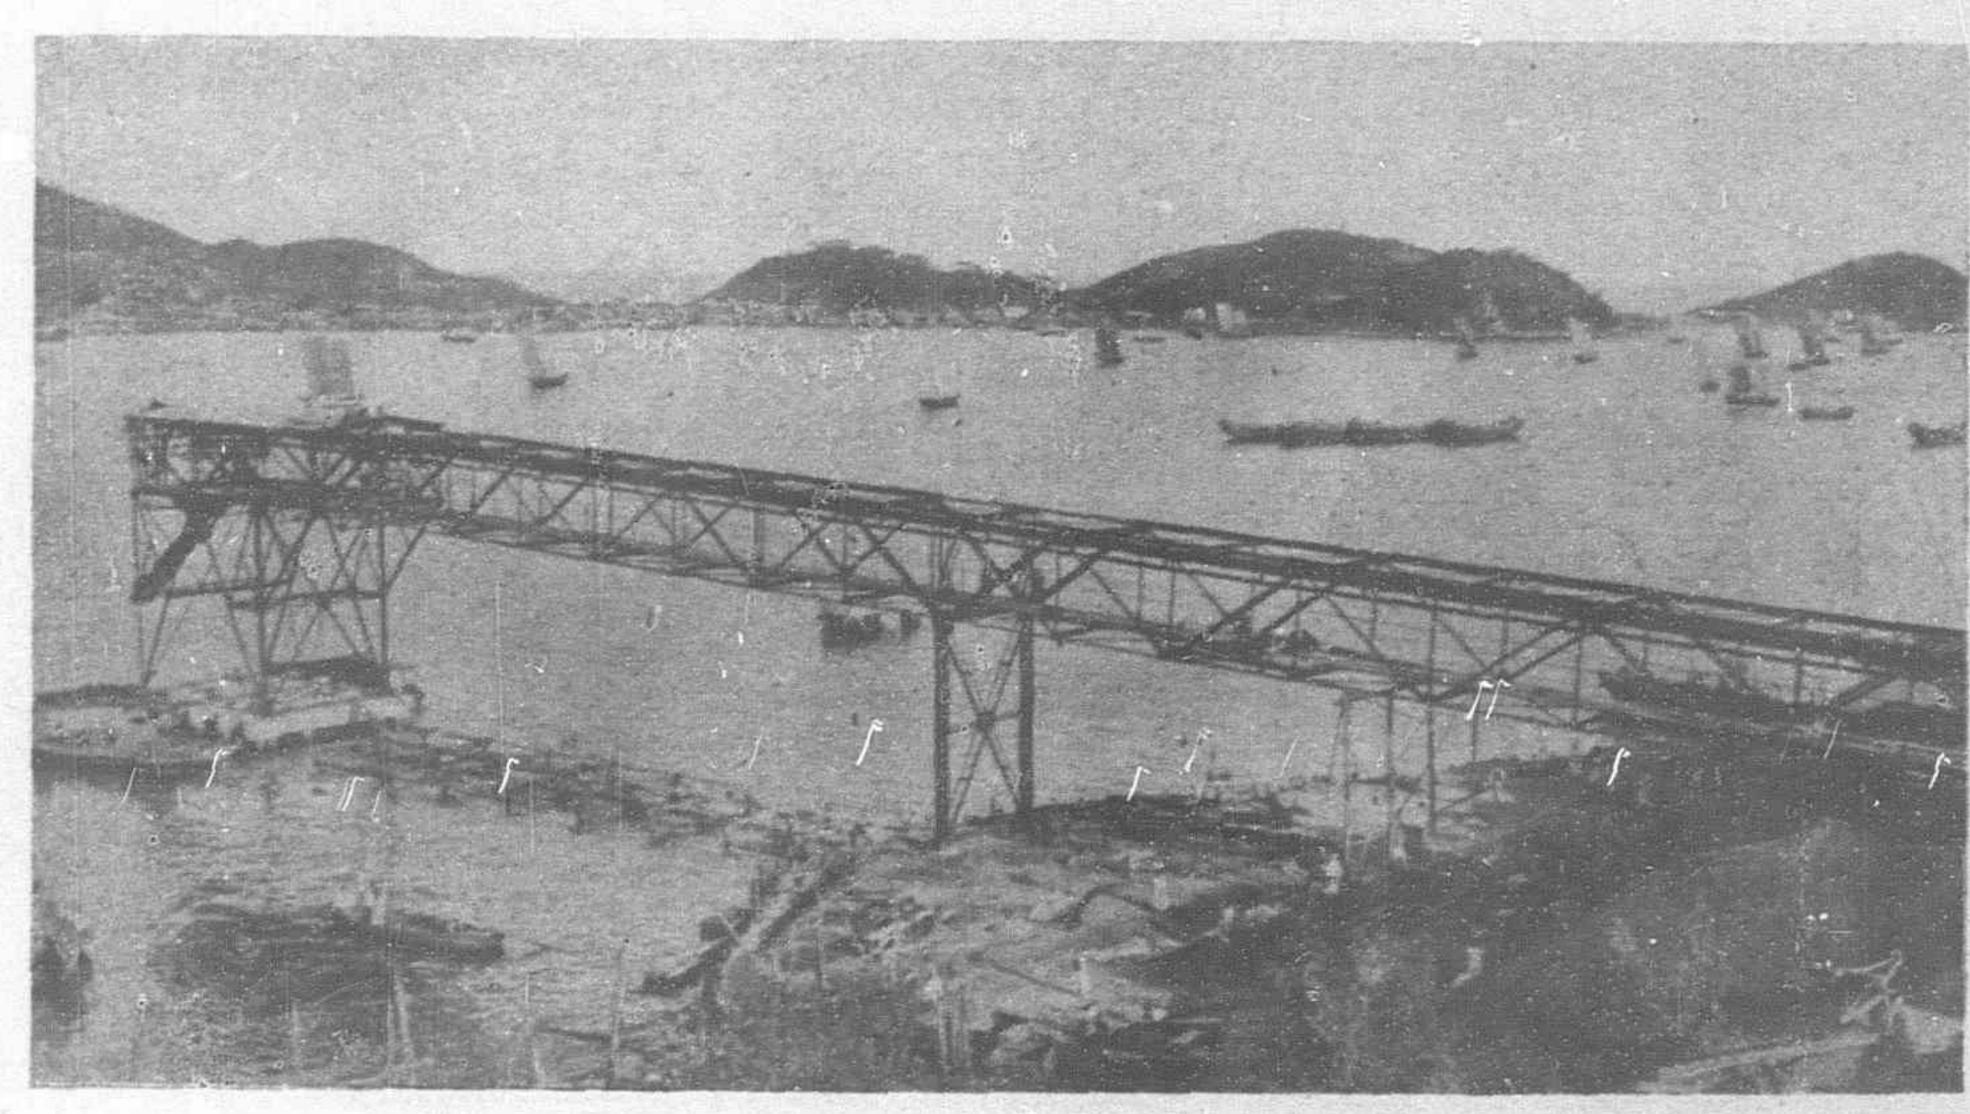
Trackway and Bridge, View from Ore Bunkers
